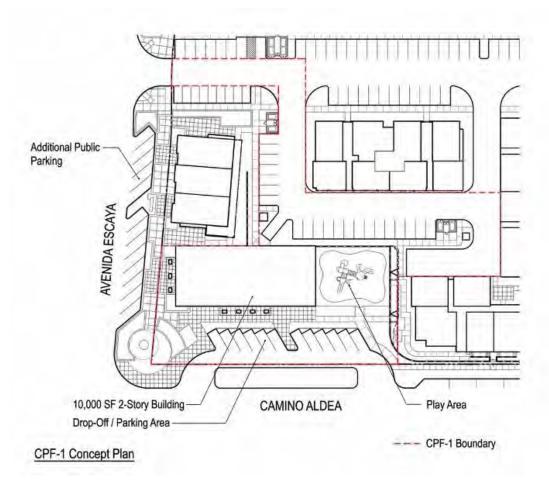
Community Purpose Facility Concept Plan (CPF-1)
